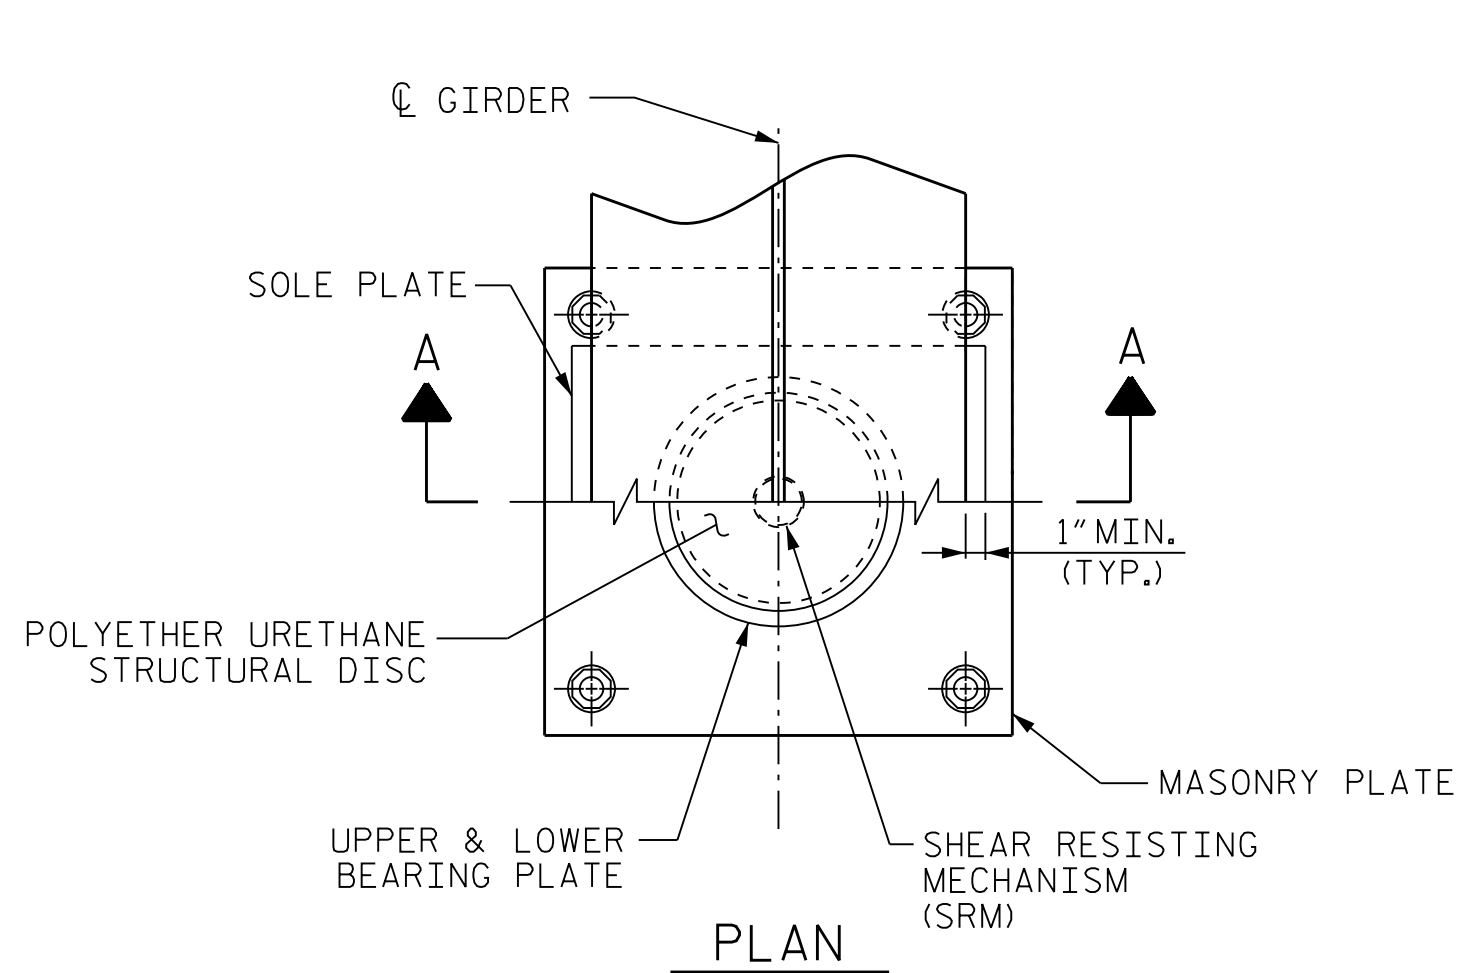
PLATE SETTING DATA (EXPANSION DISC BEARINGS)
